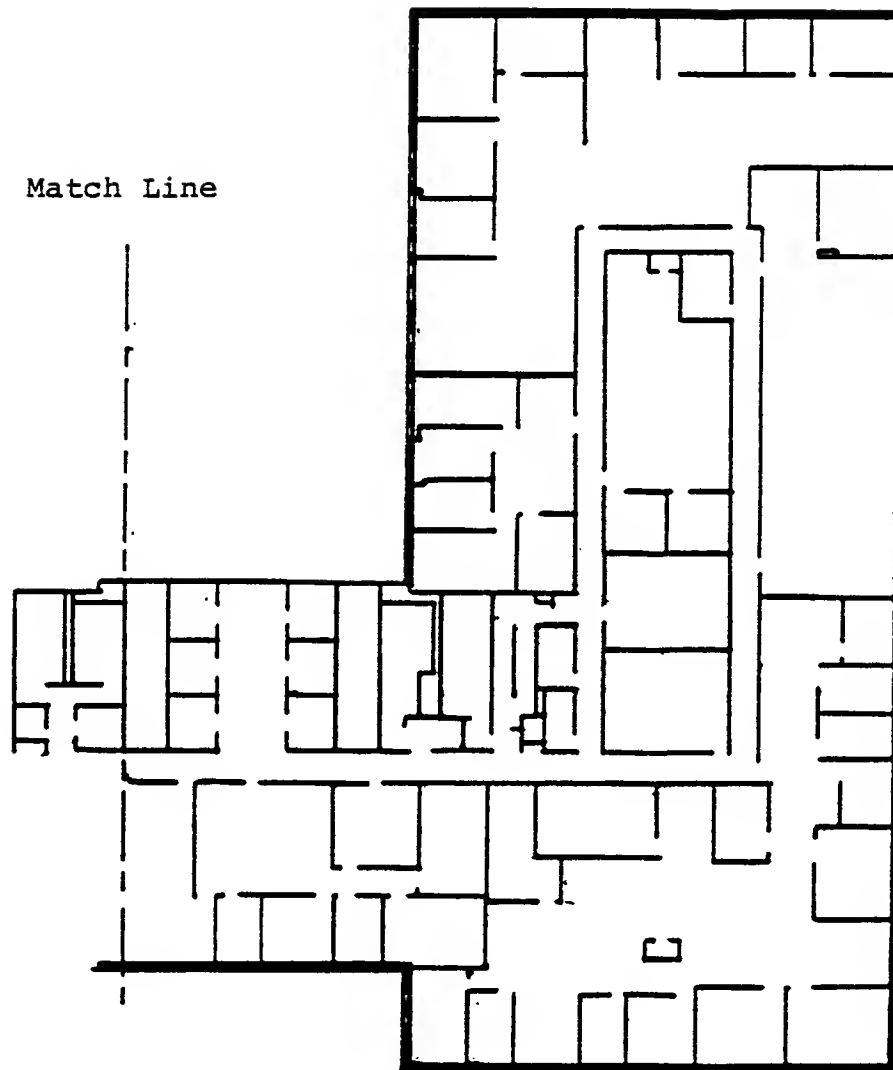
USIA BUILDING SIXTH FLOOR-NORTH
